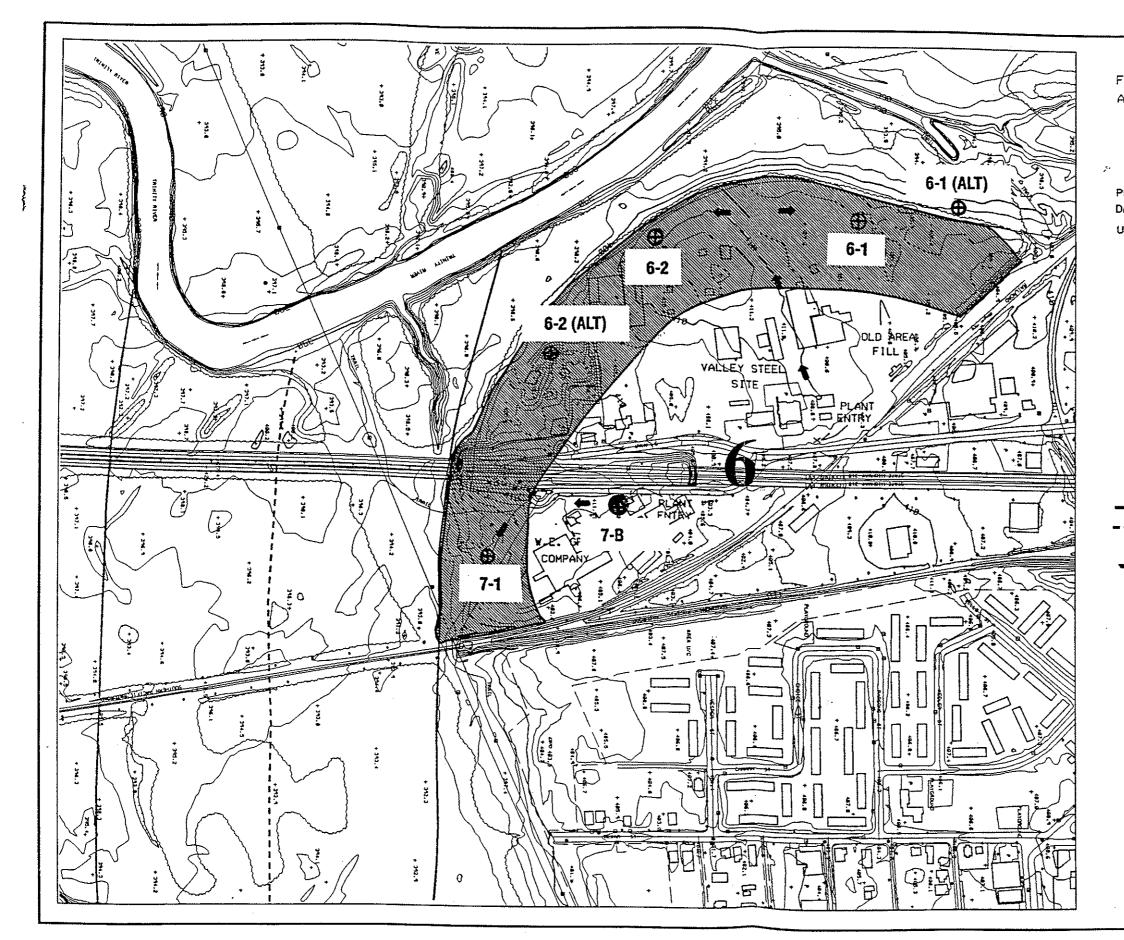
SITE INVESTIGATION PLAN AREA 6 VALLEY STEEL SITE
